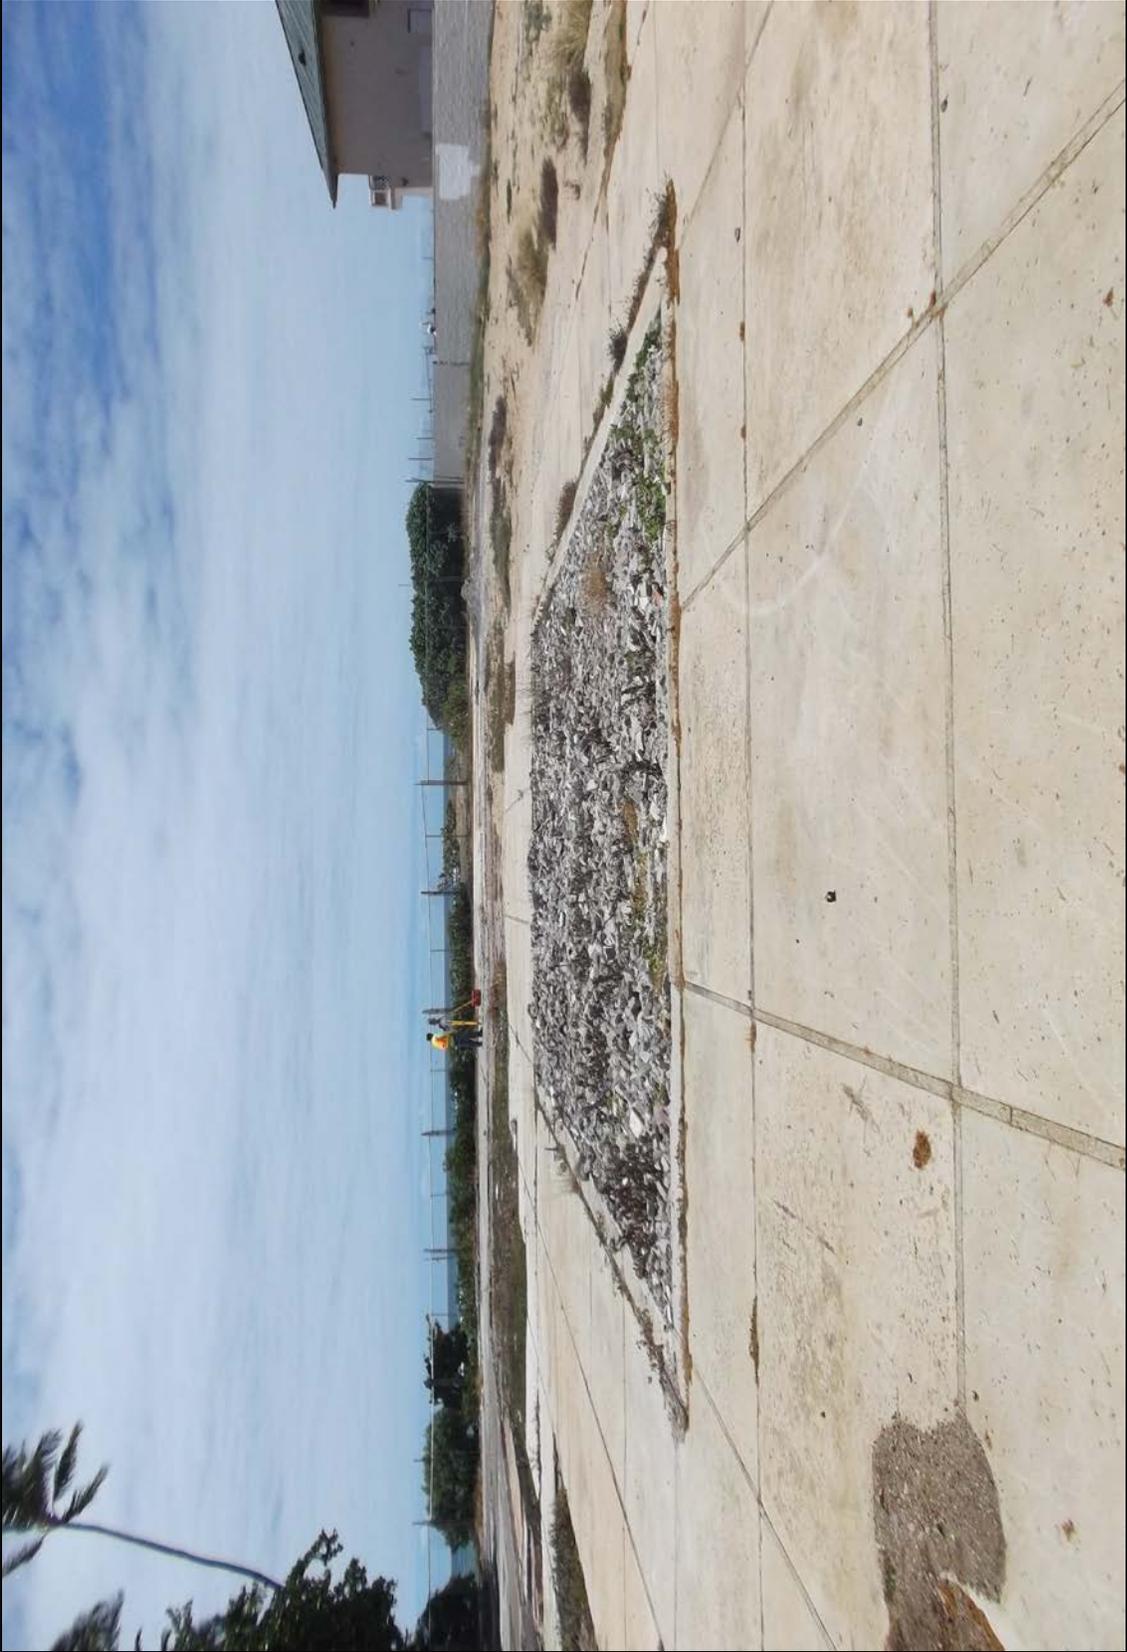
Photographic Overview Depicting the Former Primary Dwelling Foundation and Rubble Filled Swimming pool Remnants. View to South/Southeast.
